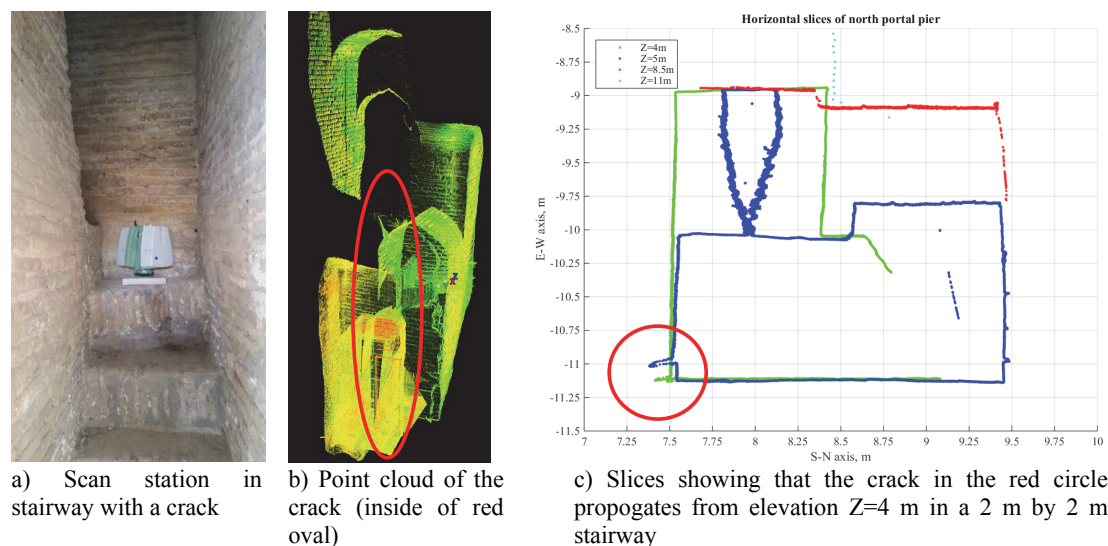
Continuous crack in a narrow stairway (north pier of portal).
